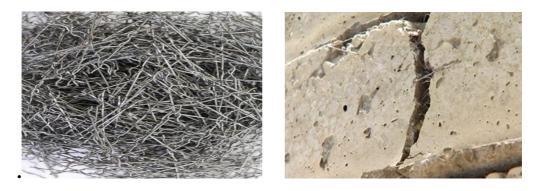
Steel Fibers and the crack of the steel fiber reinforced concrete
